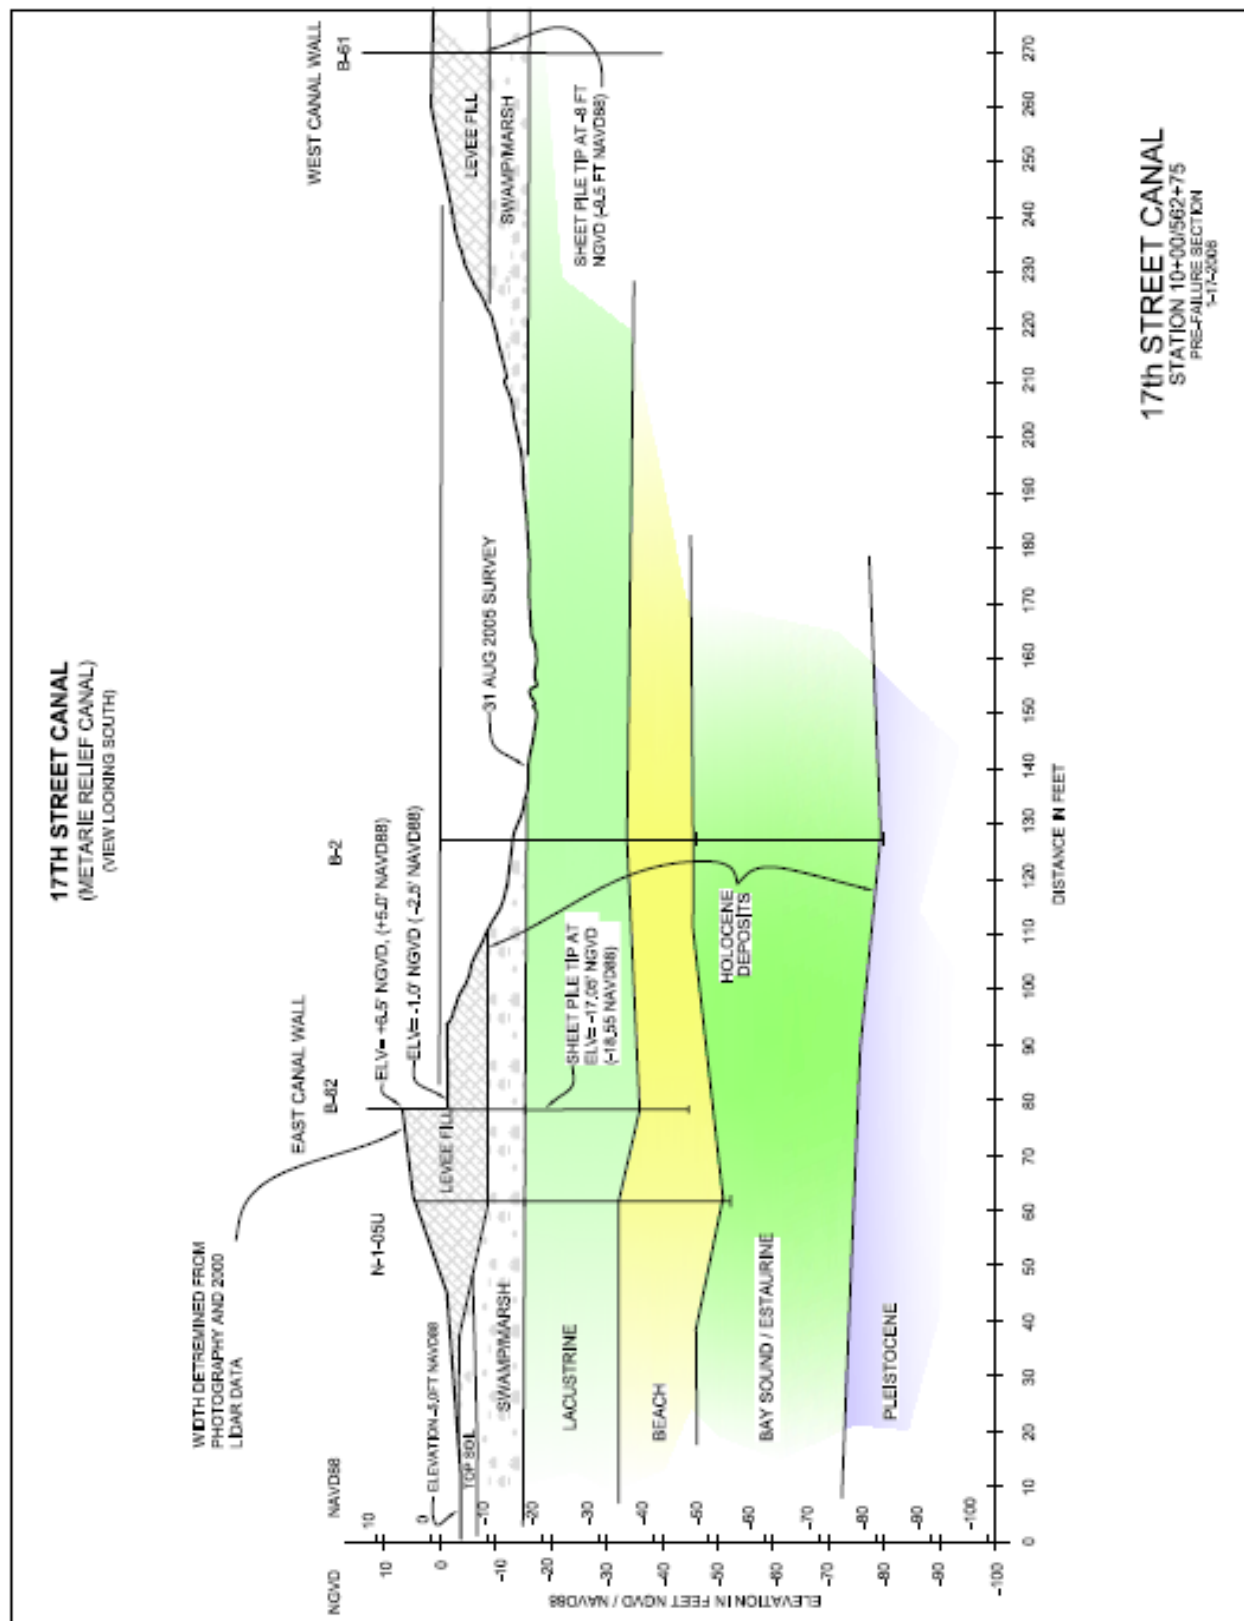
Pre-failure cross section 17th Street Canal breach (IPET 2006)
